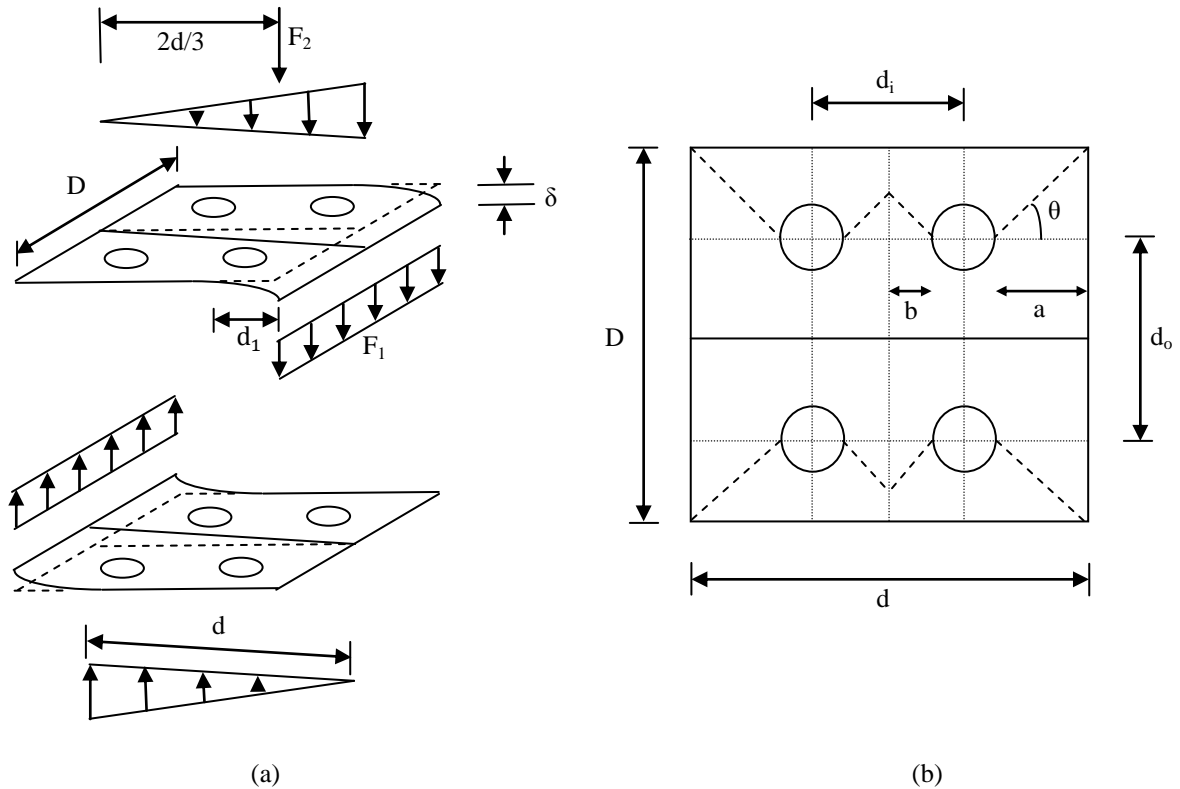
(a) Deformation of bolted flanges, (b) Dimensions of bolted flange.
